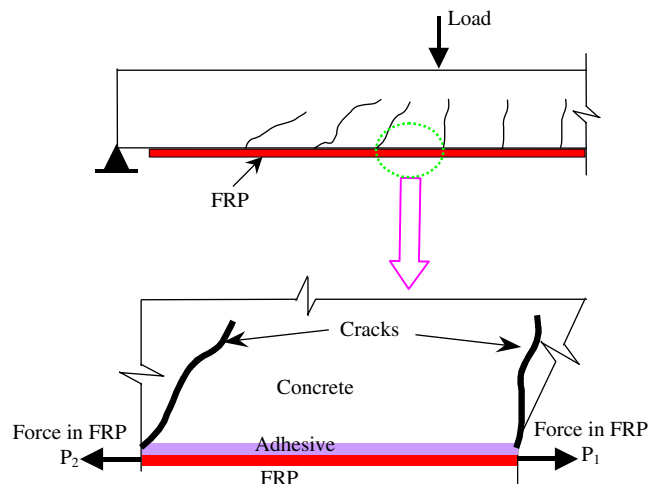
Forces in an FRP plate bonded to a cracked RC beam.
